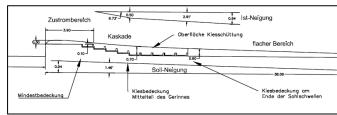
Detail of plan drawing for the conversion to a bottom glide with gravel filling
